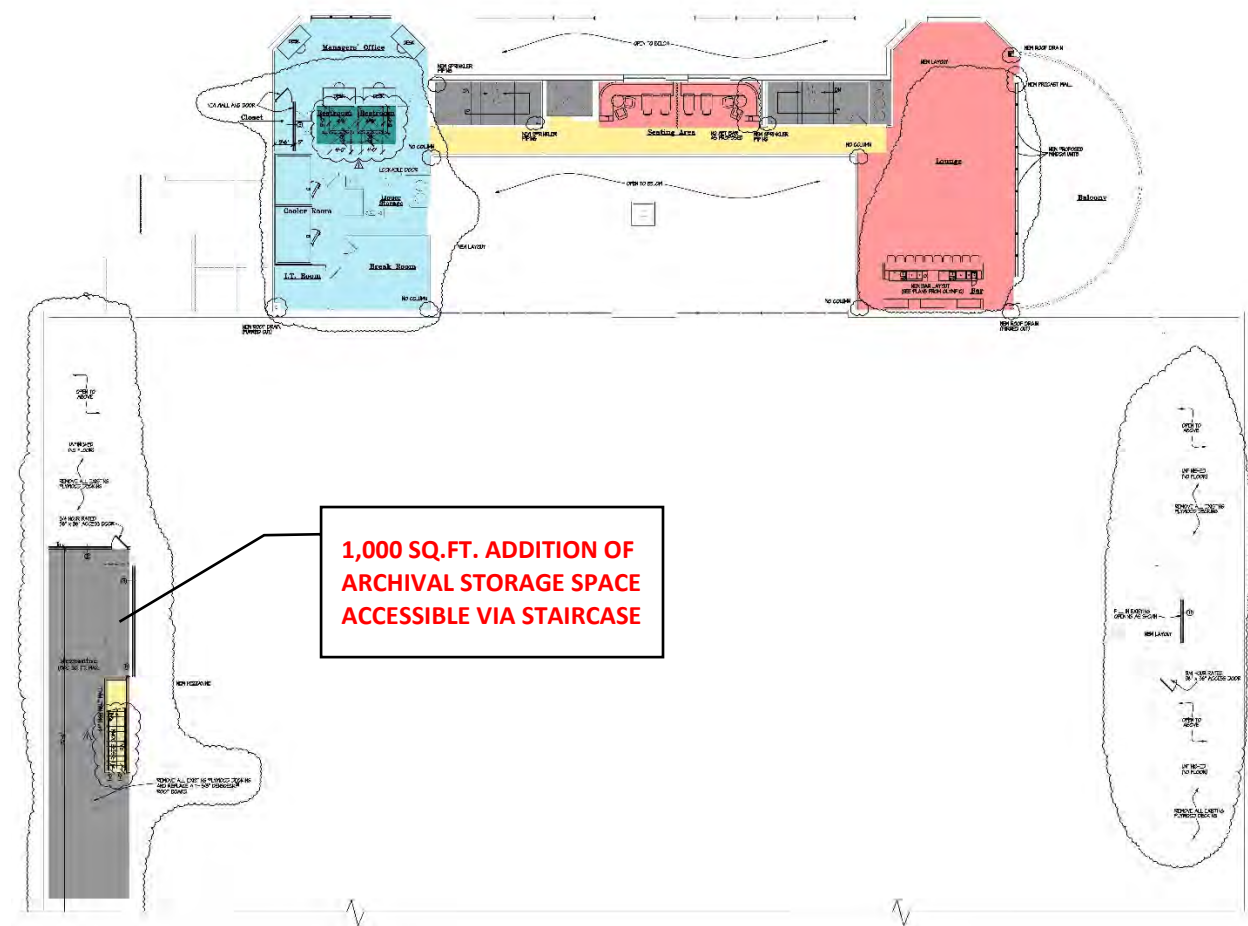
Proposed Partial Mezzanine/2nd Floor Plan
